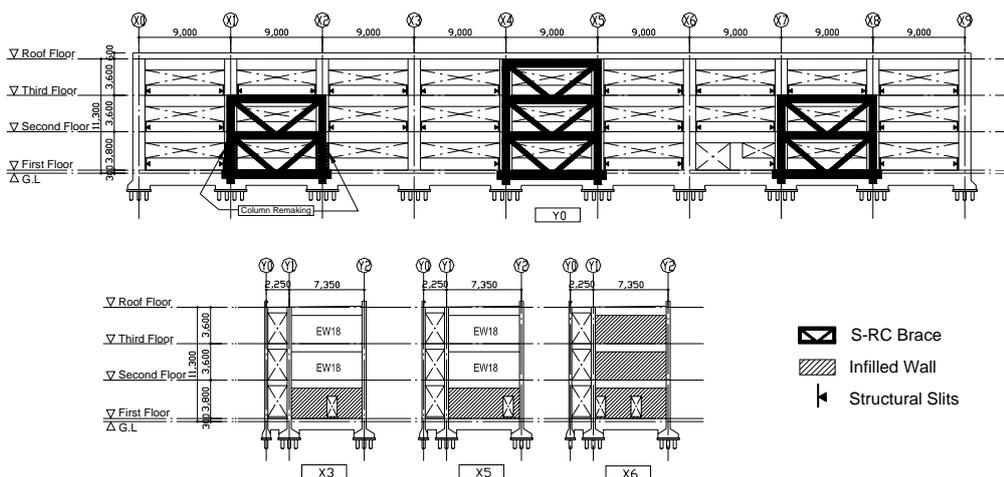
Arrangement of Retrofitting Members in Elevation and Sections
